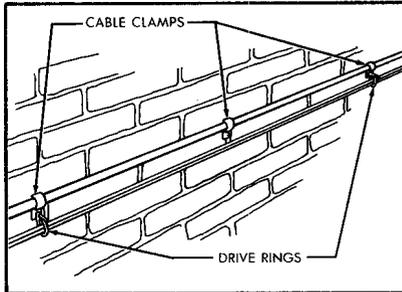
Drive Ring or Bridle Ring Run Paralleling Cable Attached with Cable Clamps
